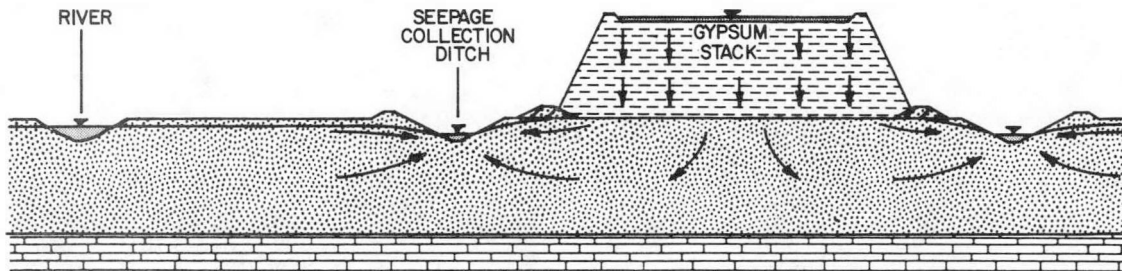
Perimeter Seepage Collection Ditch For Gypsum Stack on a Deep Sand Deposit Overlying an Impervious Foundation
